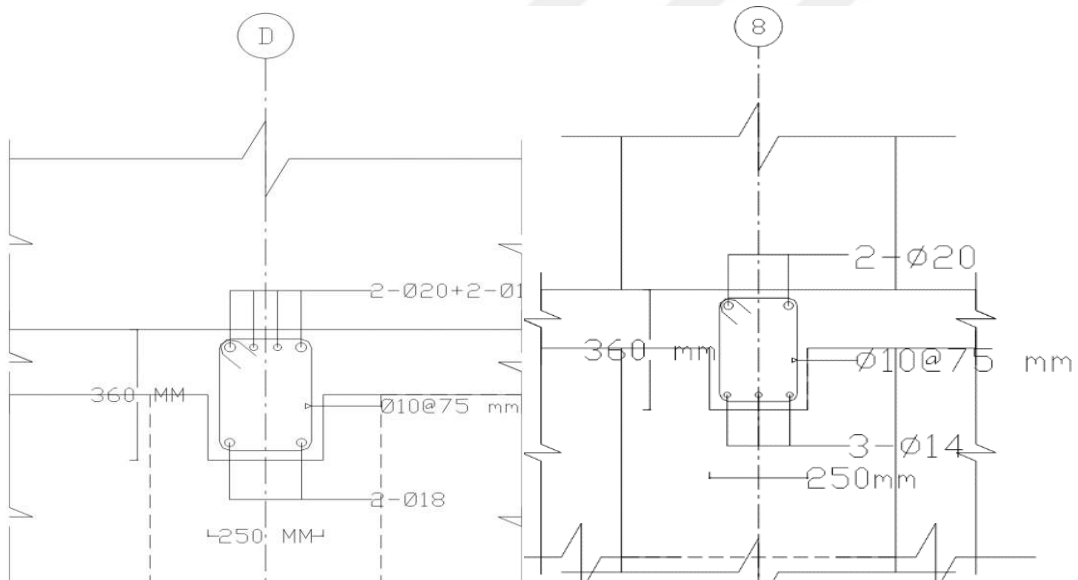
Show Steel Reinforcement Detail for Beam (B1&B2&B3) Model (6.3-5.5-5.2).
